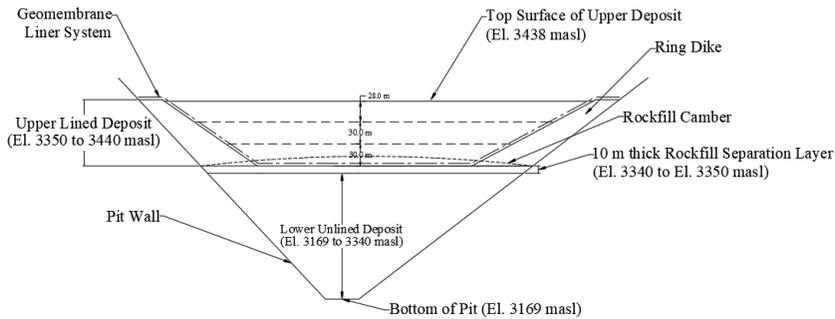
Planned Development of Tailing Deposits and Rockfill Separation Layer within Pit
